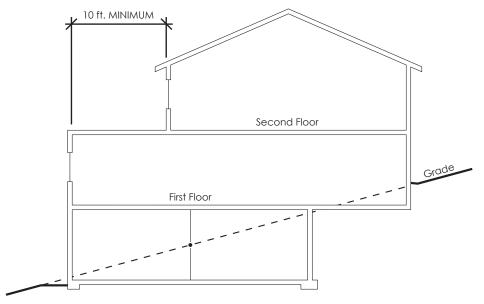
Illustration of Two-story Maximum for 10 ft adjacent to the Downhill Face of Structure
